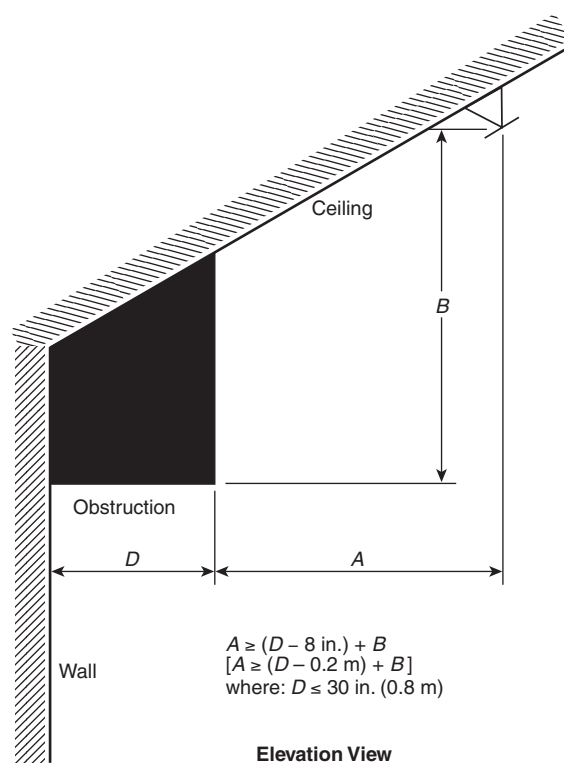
(b) Positioning of Sprinkler to Avoid Obstruction Against Wall (Residential Upright and Pendent Spray Sprinklers).
